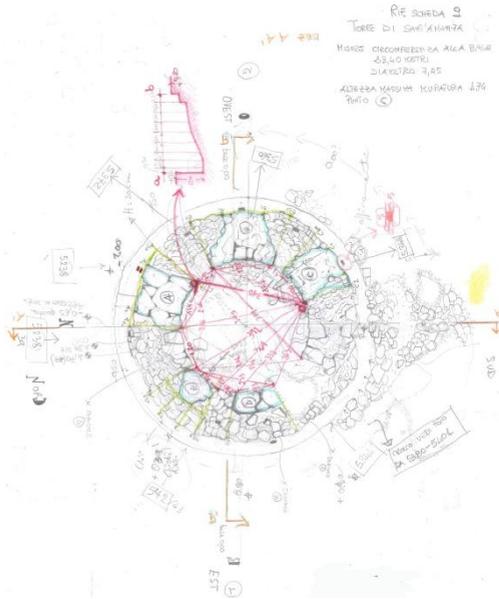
Sant'Amanza tower's study sketches. The tower's upper walls sections were relieved by section survey. (Marino, 1990).
